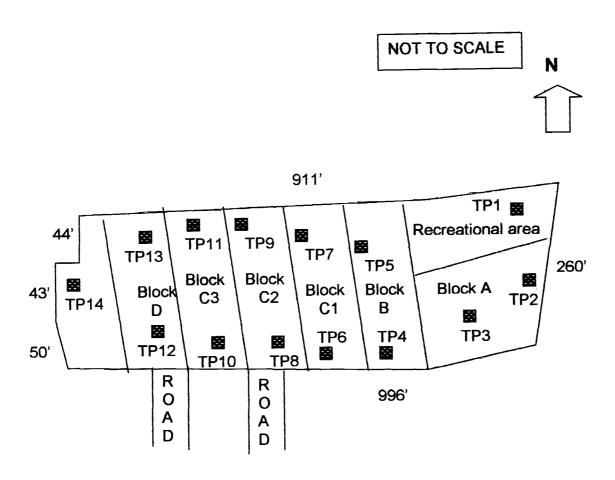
Layout Plan for Residential Buildings at Nagaram, Keesara (M), showing locations of trial pits.
